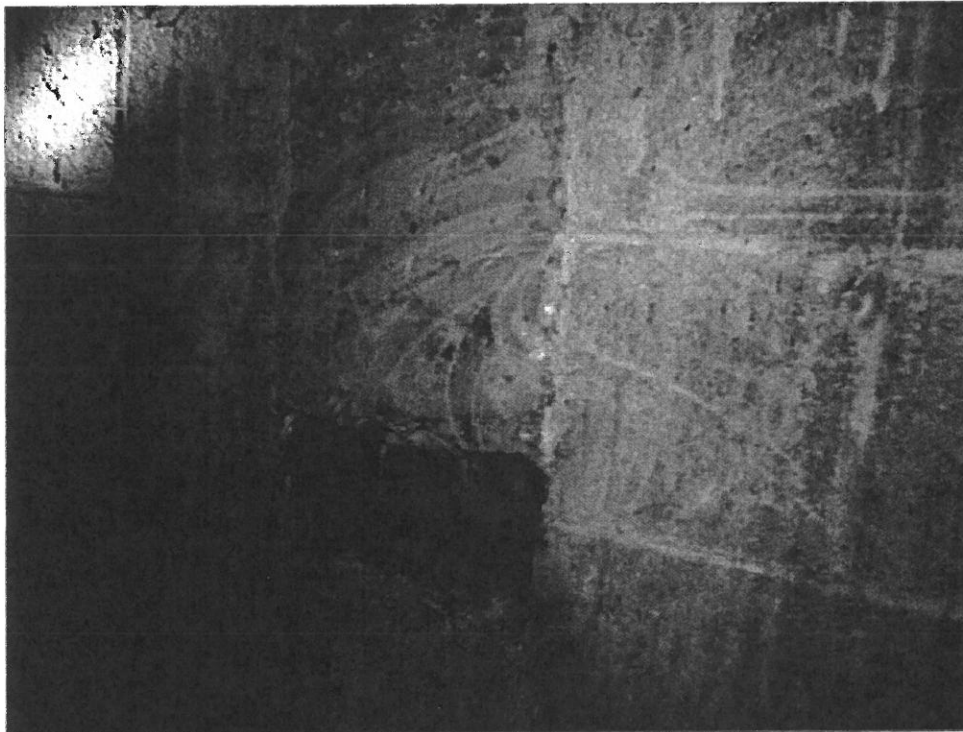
Corrosion on metal deck in crawlspace under 7th grade classrooms.
